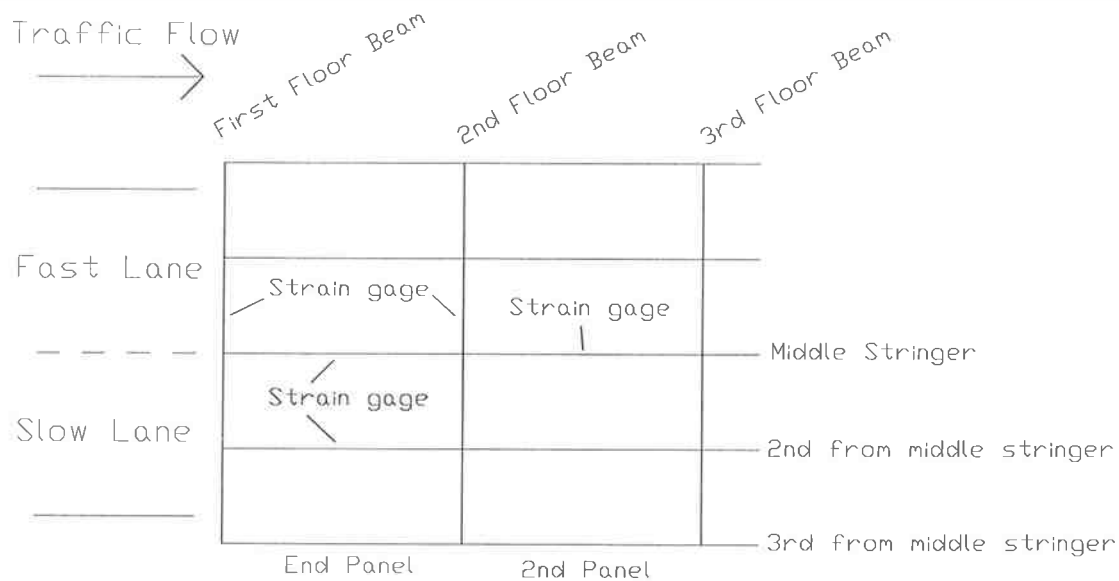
Three stringers and two floor beams on the northbound structure of the Winchester Bridge that had strain gauges installed.
